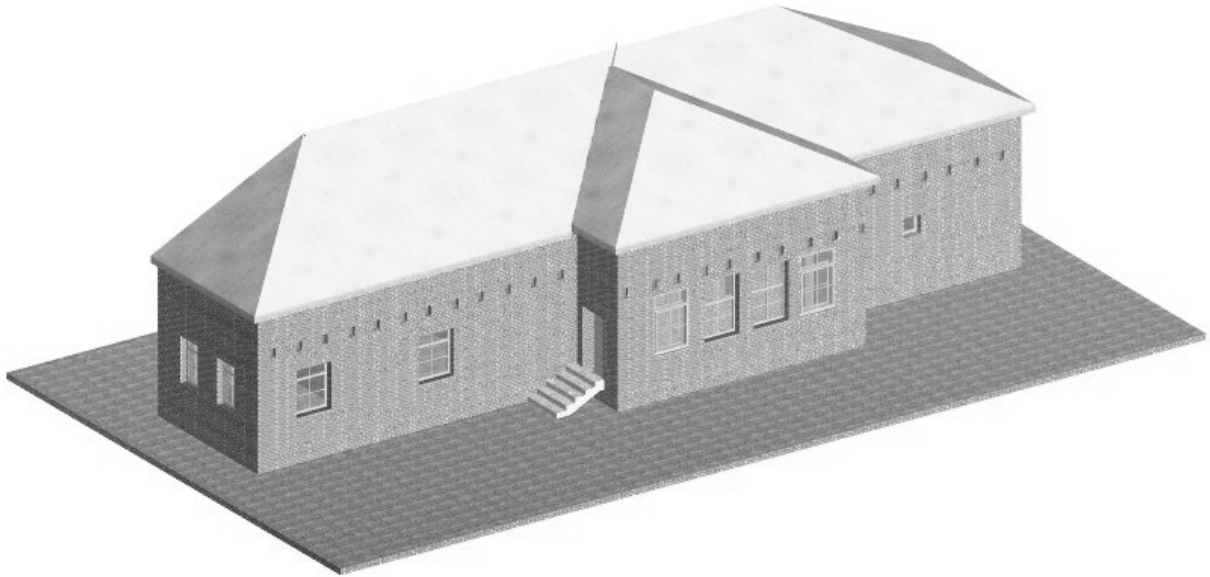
Whole view of the building with closed windows to the street (from Bostenaru, 2004, Abb. 2-4 on P. 24)
